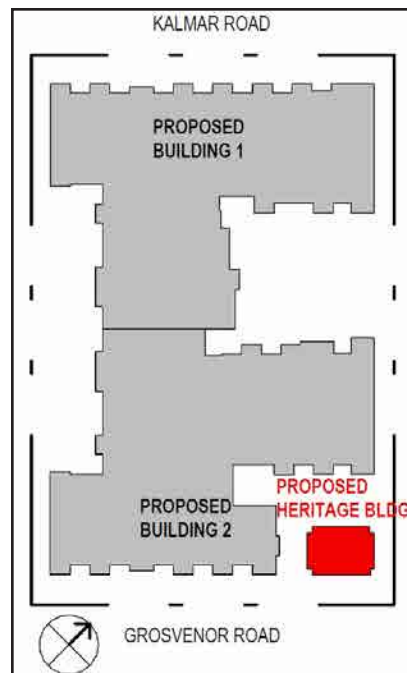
Site plan of the proposed changes to 13761 Grosvenor Road, showing the structure relocated within its lot. (Source: FLAT Architecture Inc.)
